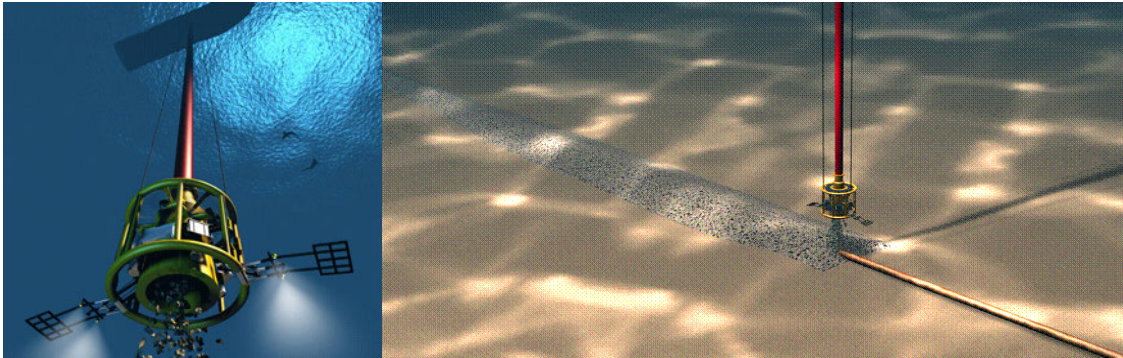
Rock installation by a Fall Pipe Vessel using a Fall Pipe Remotely Operated Vehicle
